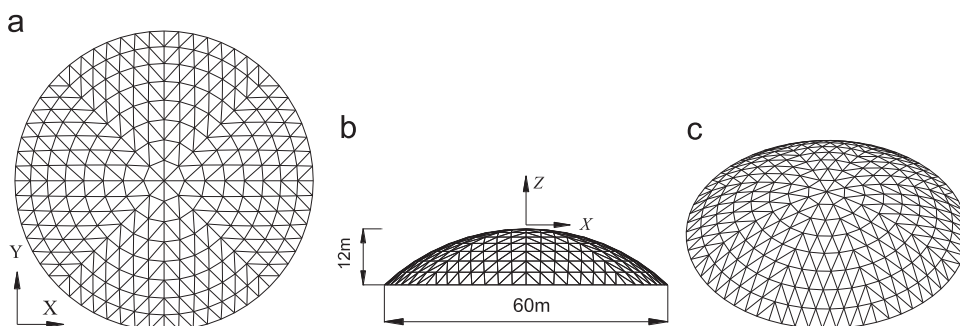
Plan, elevation and 3D views of the considered single-layer reticulated dome. (a) Plan view, (b) elevation view, (c) 3D view.
